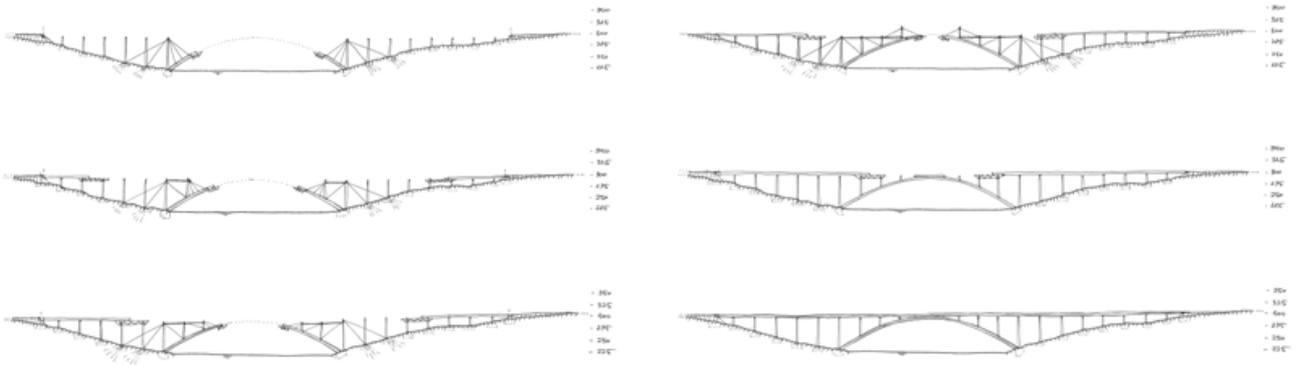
Construction alt. 2. Truss-method cantilever erection using temporary ties as the top chord
